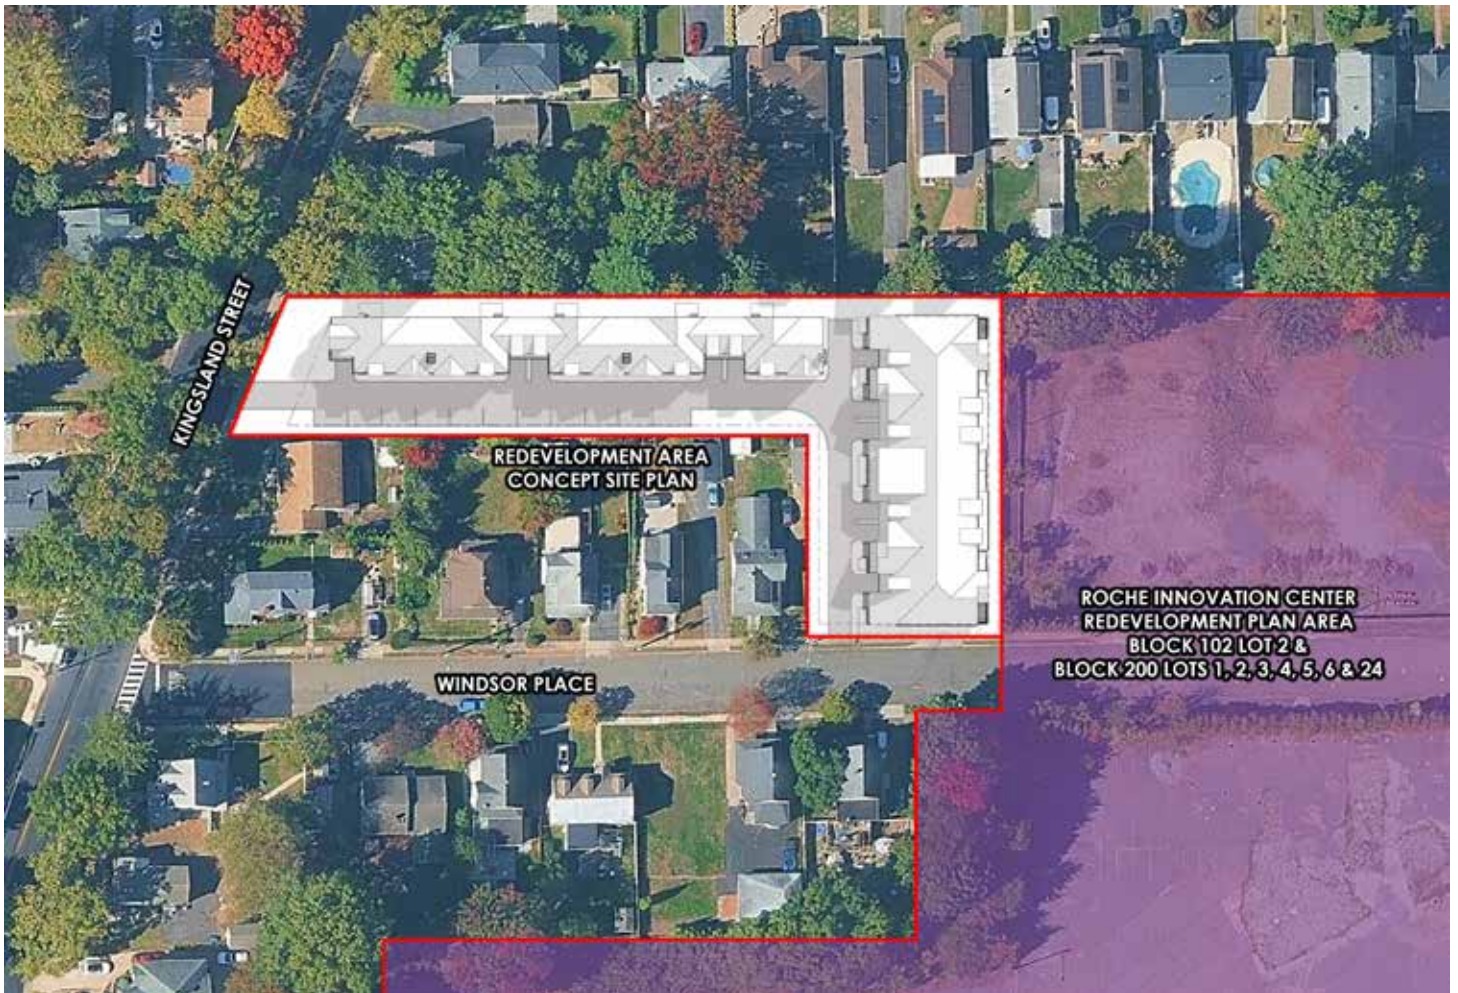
Conceptual Site Plan over Google Earth Aerial
